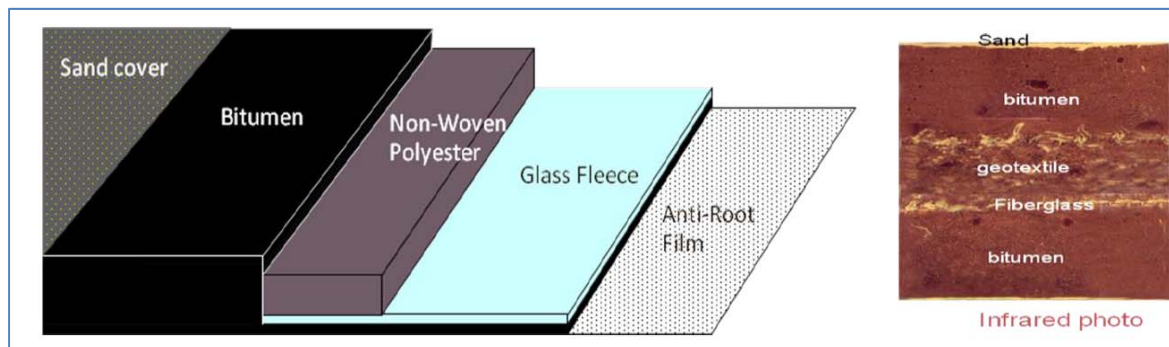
BGM section showing component layers (e.g. ES 3 BGM Coletanche^R)
